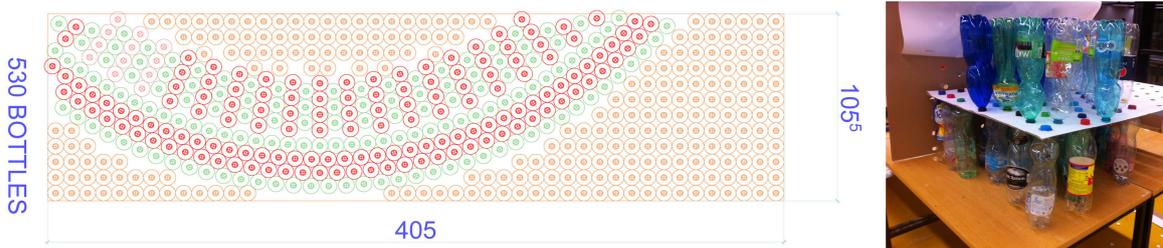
sheet module with holes for drilling (in mm), prototype of the module 1:1
